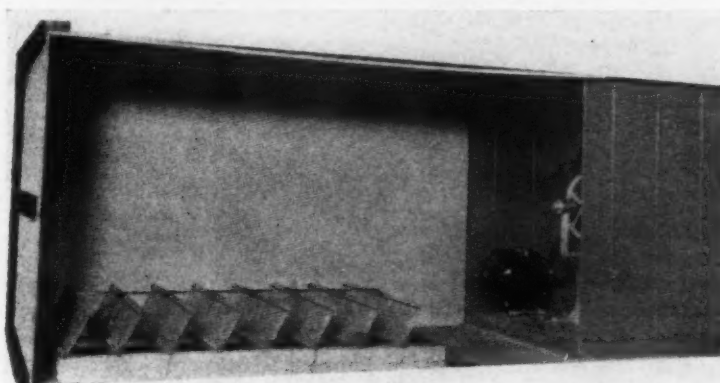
Typical wood grille installation in stair ceiling. Note neat finishing with trim. (Dallas Engineering Co., Inc. photo).
